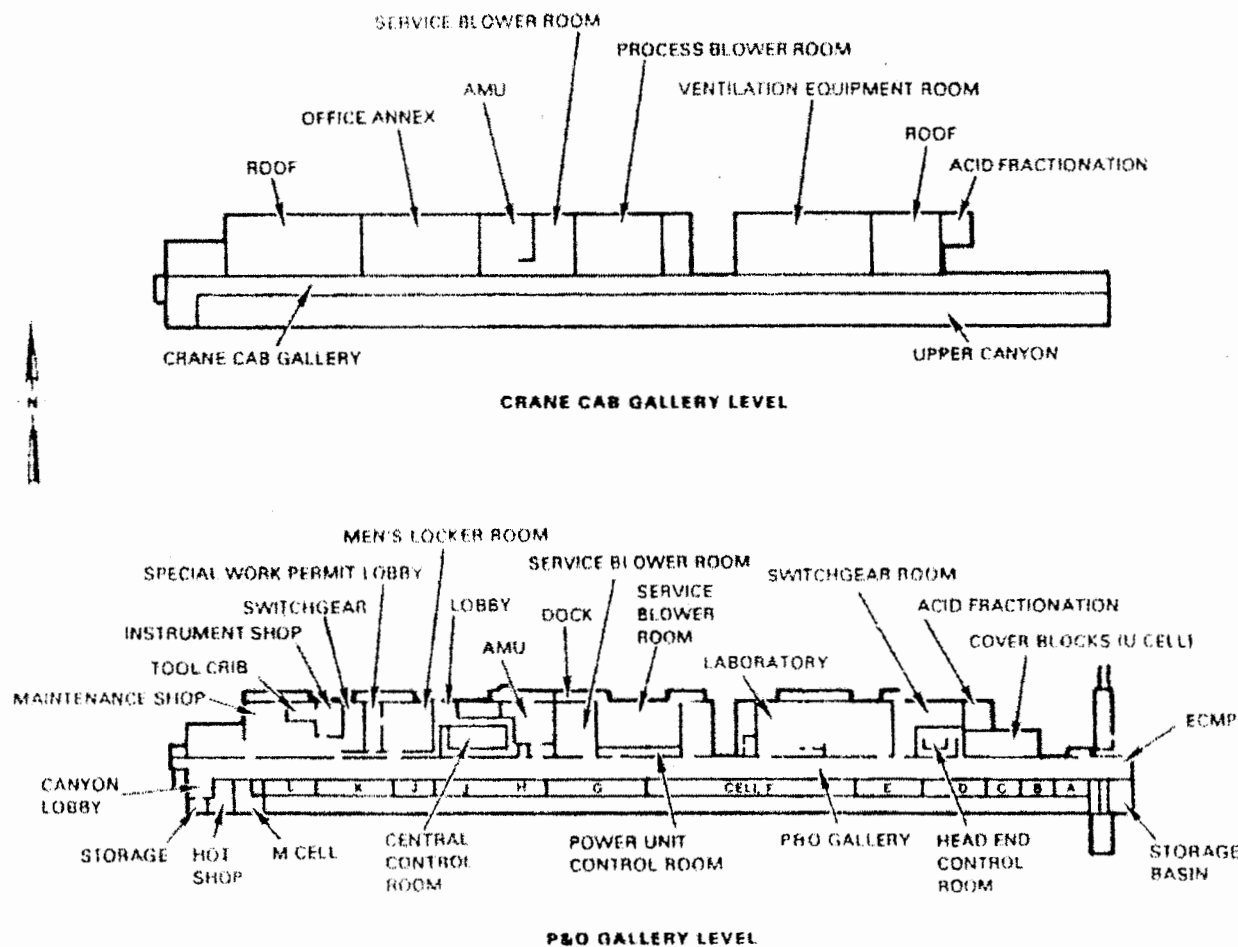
Plan Views--PUREX 202-A Building. (Sheet 1 of 2)
